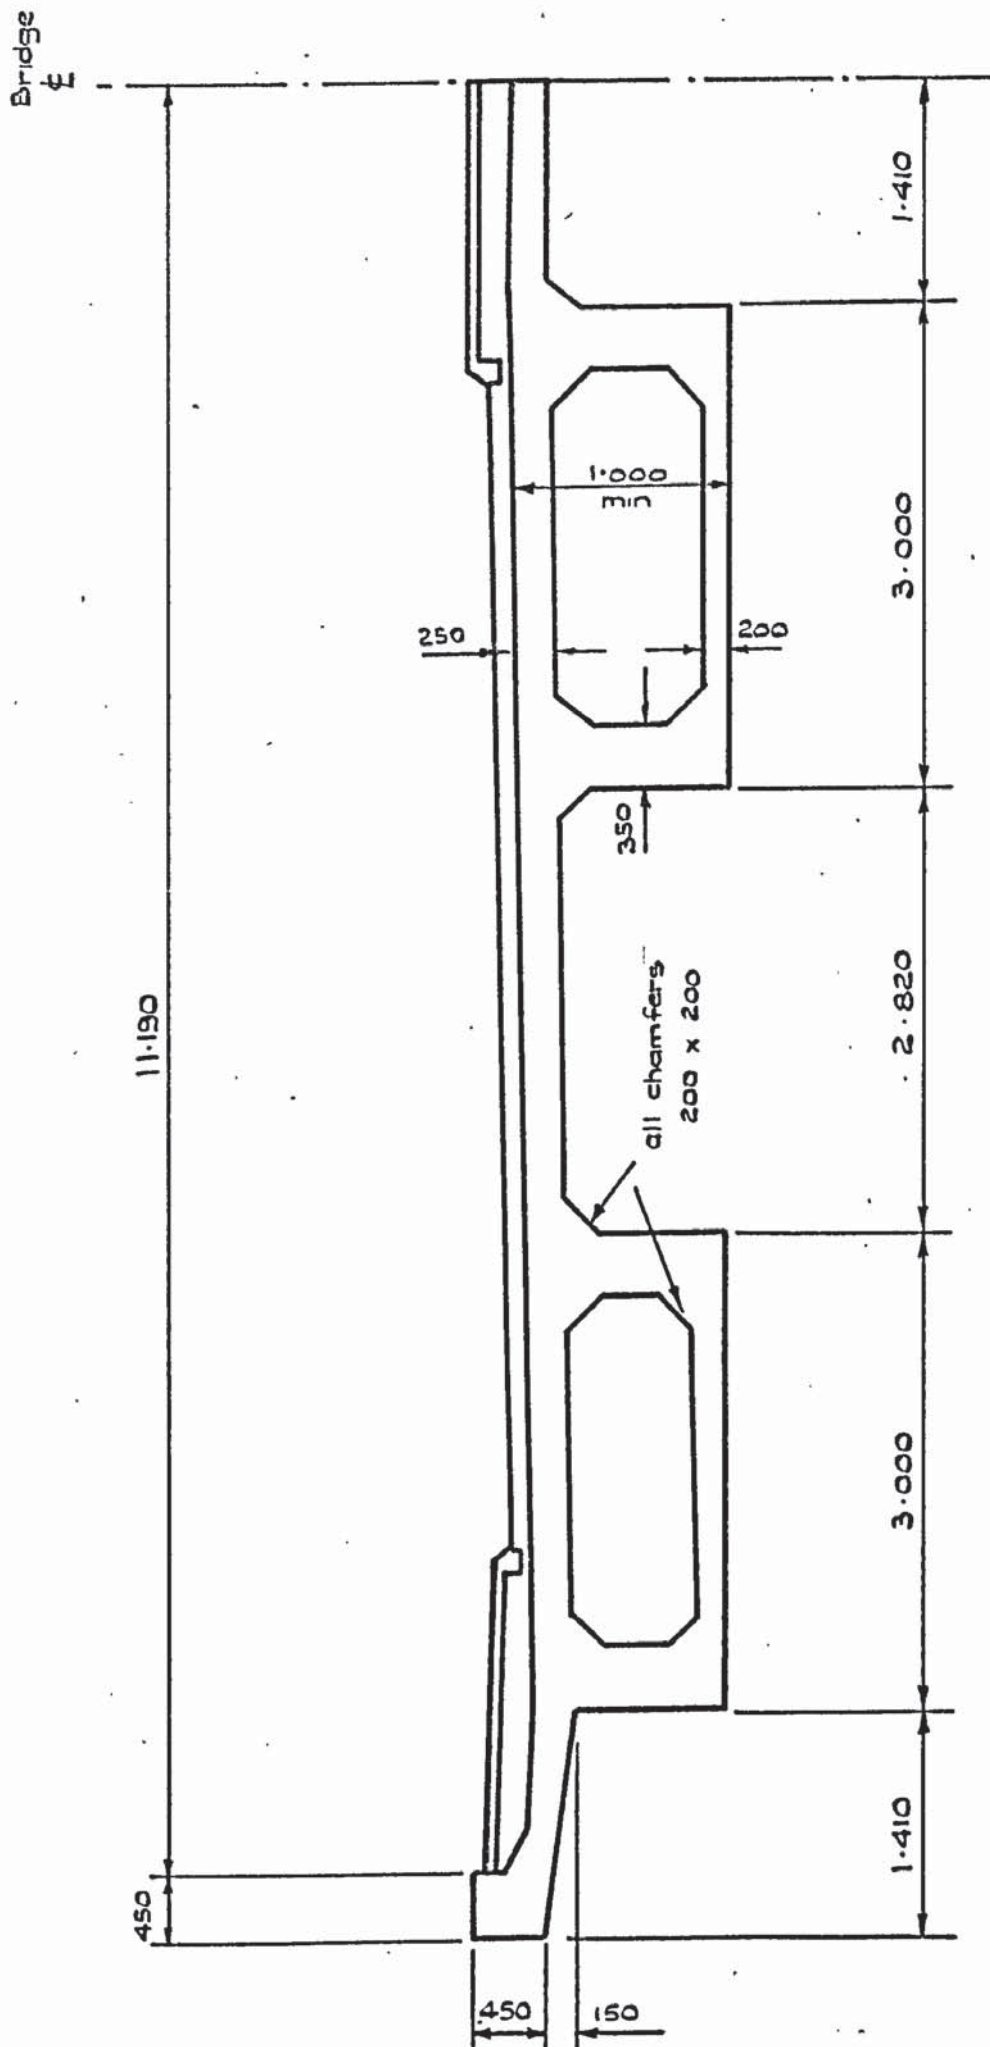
TYPICAL CROSS SECTION OF BRIDGE.
